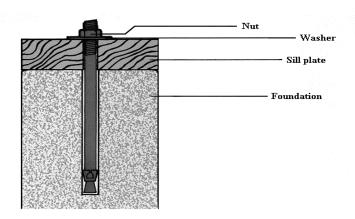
Anchor bolt in concrete (A word about anchor bolts, 1992)
